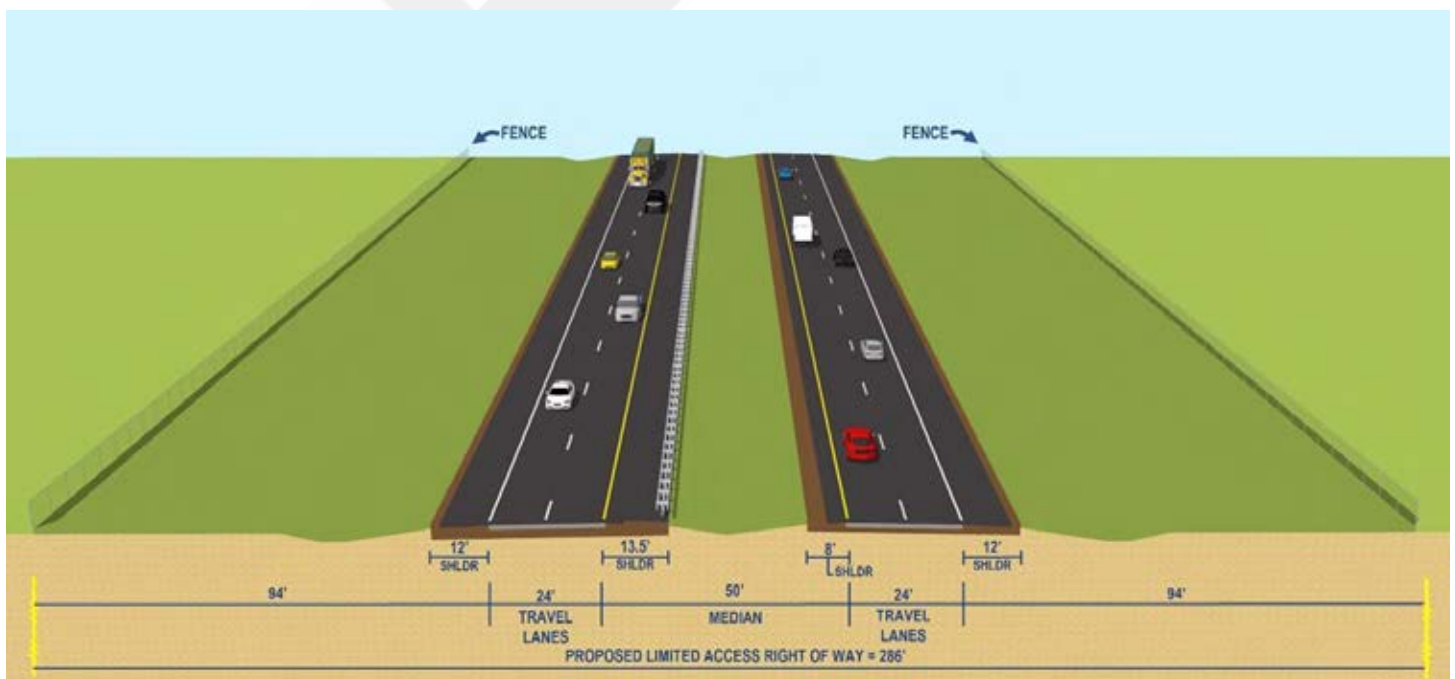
Preferred Alternative - New Alignment Typical Section
